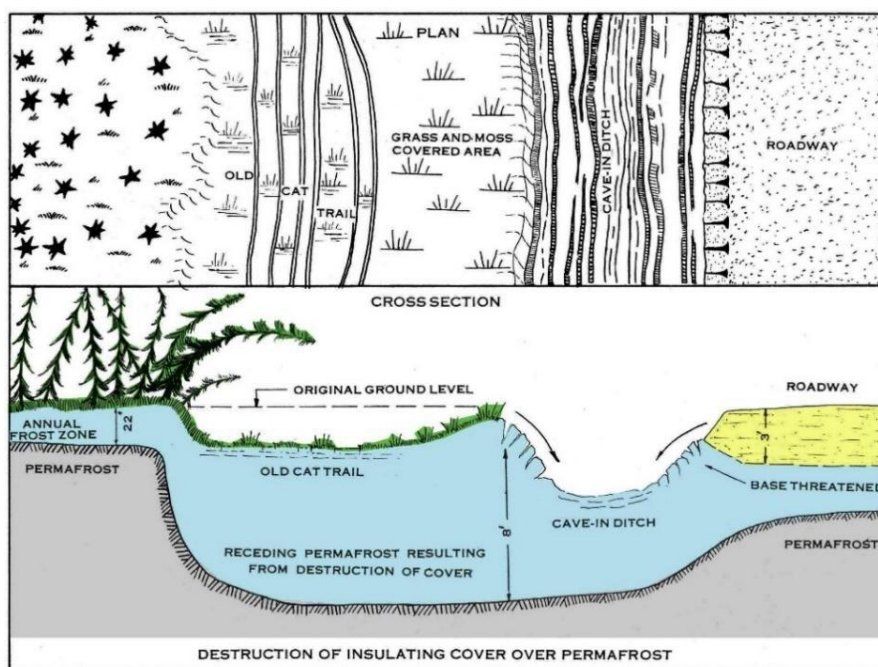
Old tractor trails excavated on permafrost allowed water to pond and infiltrate zones adjacent to the Alcan Highway, undermining the pavement subgrade (modified from Muller, 1947).
